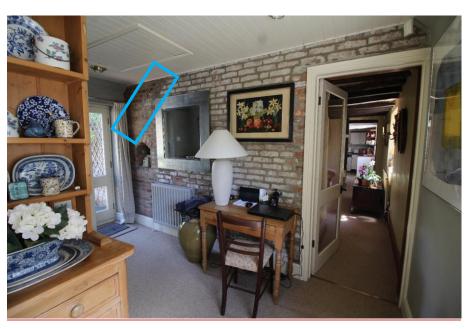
West elevation of the living room at 6 Westfield Lane. Looking east. Note the roofs scar highlighted in blue.
